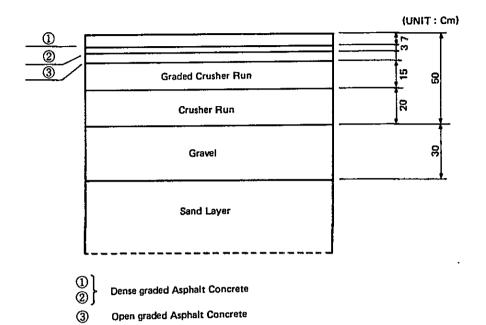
Asphalt Concrete Pavement for Container Yard
